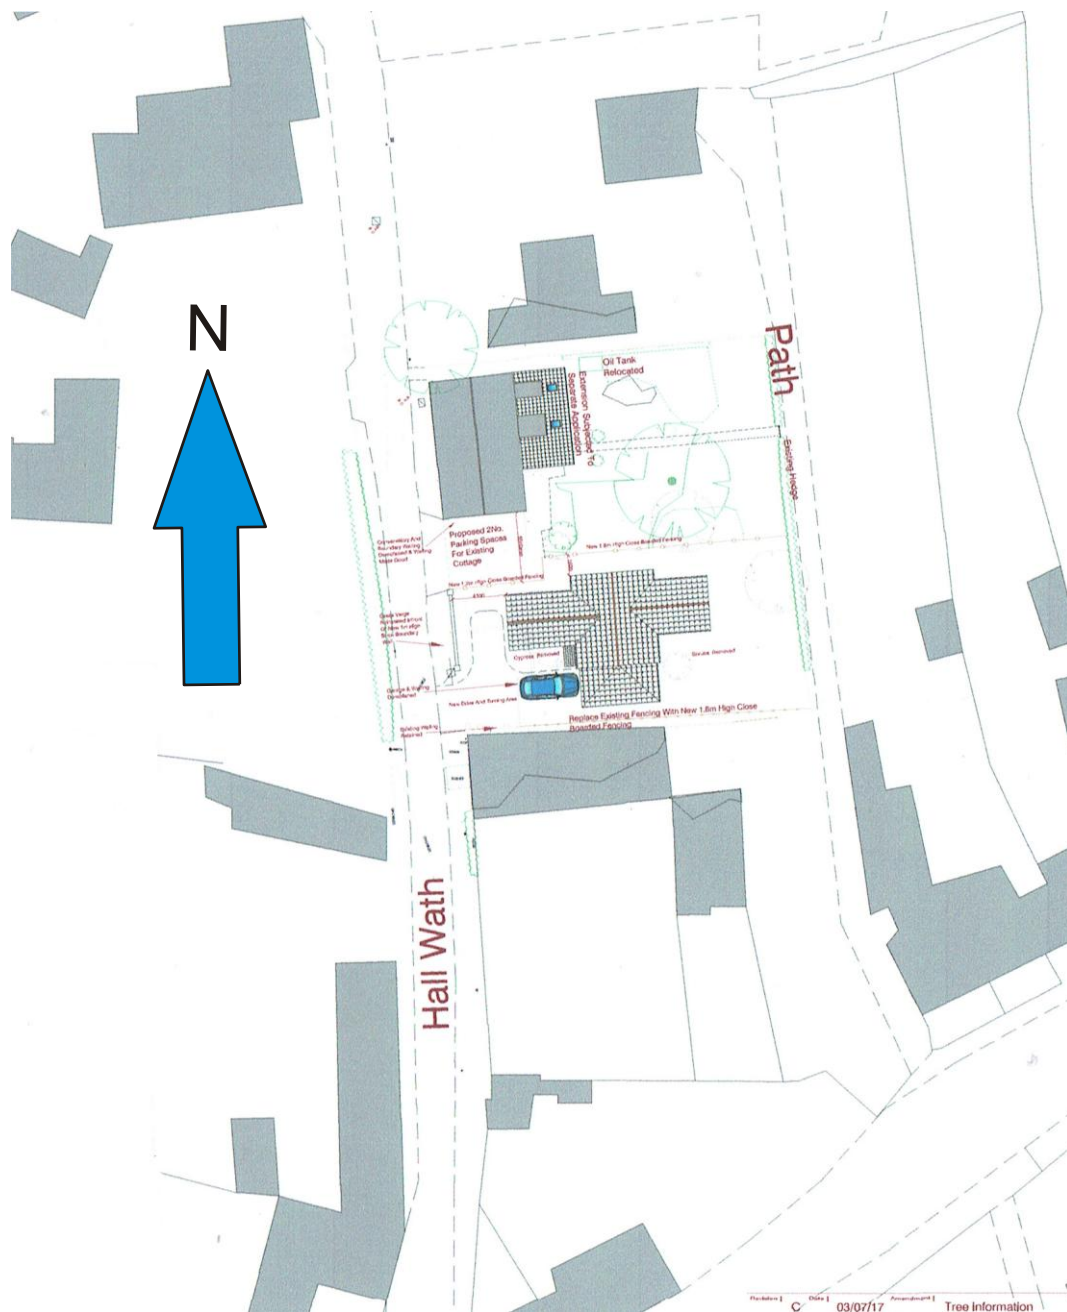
Block plan showing the proposed layout of the development site at an original sale of 1:1,250 at A4, (extract from Architects plan).
